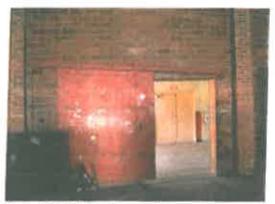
Sliding door and track on Side C of Room 1 - LBP.
